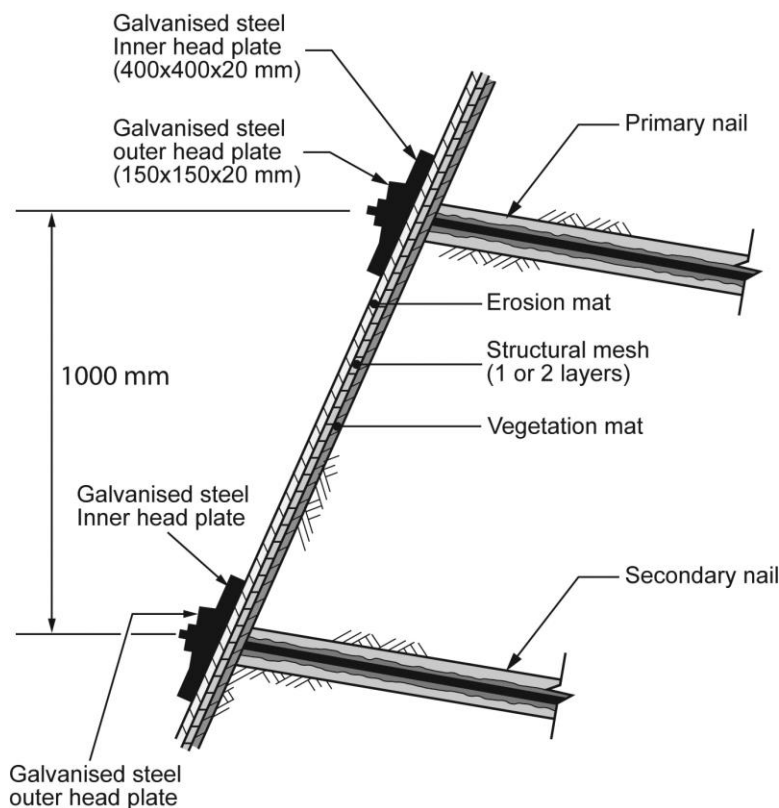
Typical details of a flexible facing system (Phear, et al., 2005)
